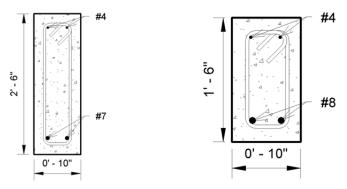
Reinforcement design of Alternate (1) Note: Not to Scale
